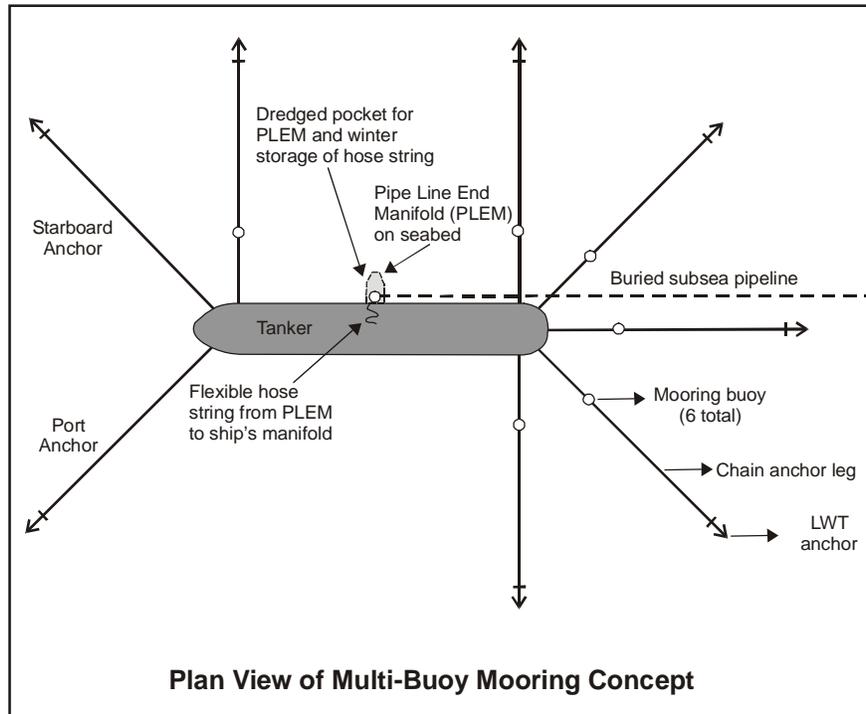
The multi-buoy mooring (MBM) concept plan view.
